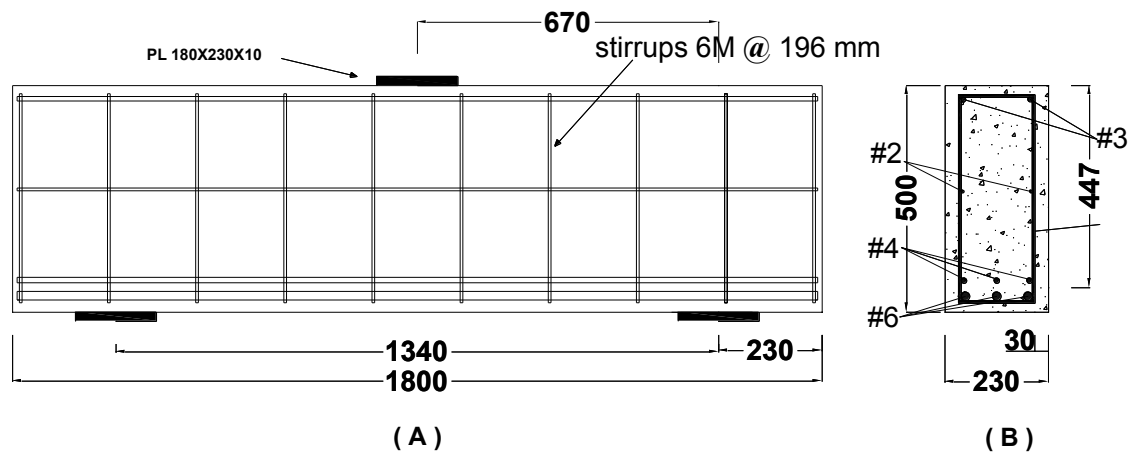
Beam B1.5/100: (A) elevation (B) cross section
